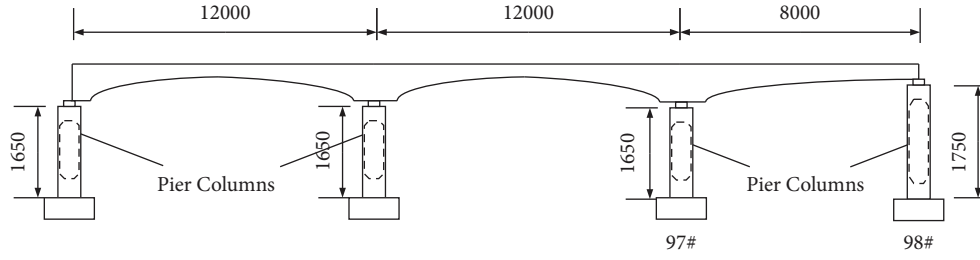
Elevation of a three-span continuous bridge (unit: cm).
